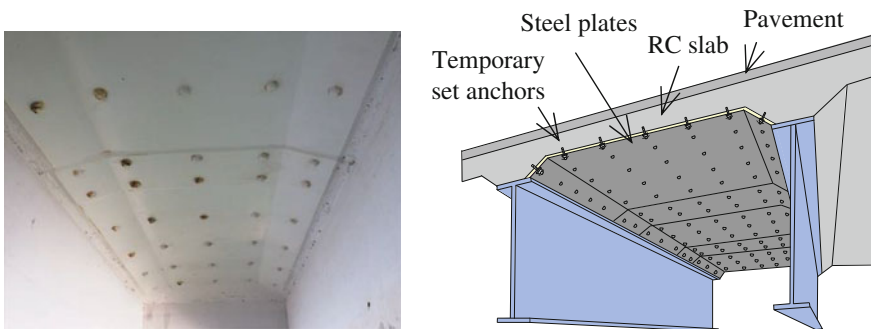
A picture and a schematic of an RC slab bonded with steel plates
